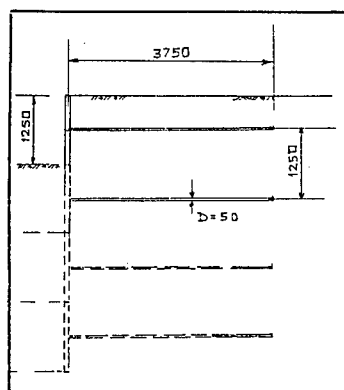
Model Cross-Section to Prototype Dimensions (mm.)
